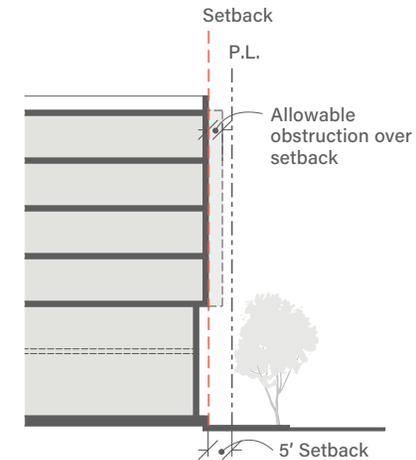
Type B – Typical Streetwall and Park Frontage Setbacks
